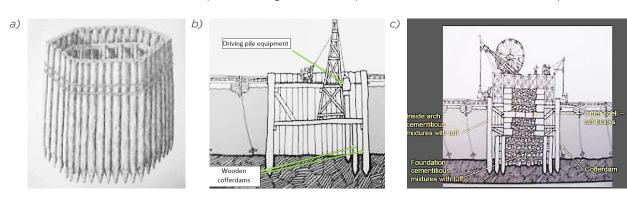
The main masonry arch bridge components and foundation construction process used in the past, (Madrid Engineering Group, INC., 2008) | a) A wooden cofferdam b) Positioning of the cofferdams; c) Foundation construction
